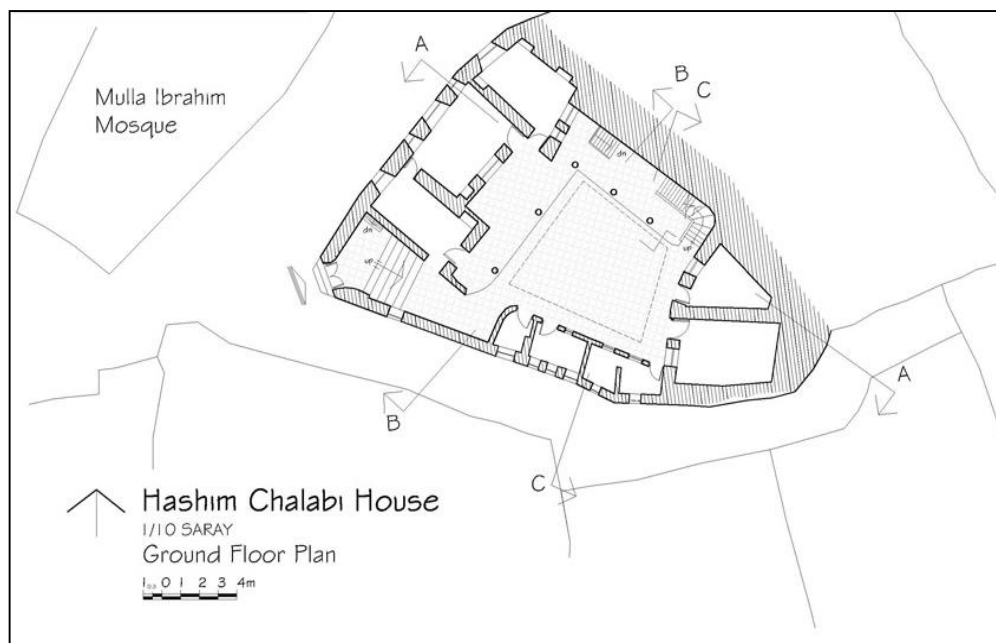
Plan of the ground floor in Hashim Chalabi house (HCECR, 2012)
